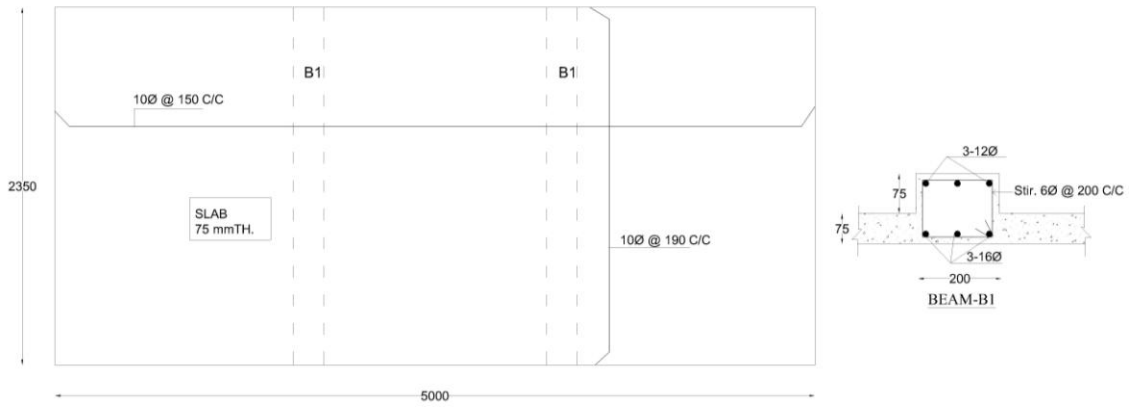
Reinforcement Detailing of Slab, 3PSF
